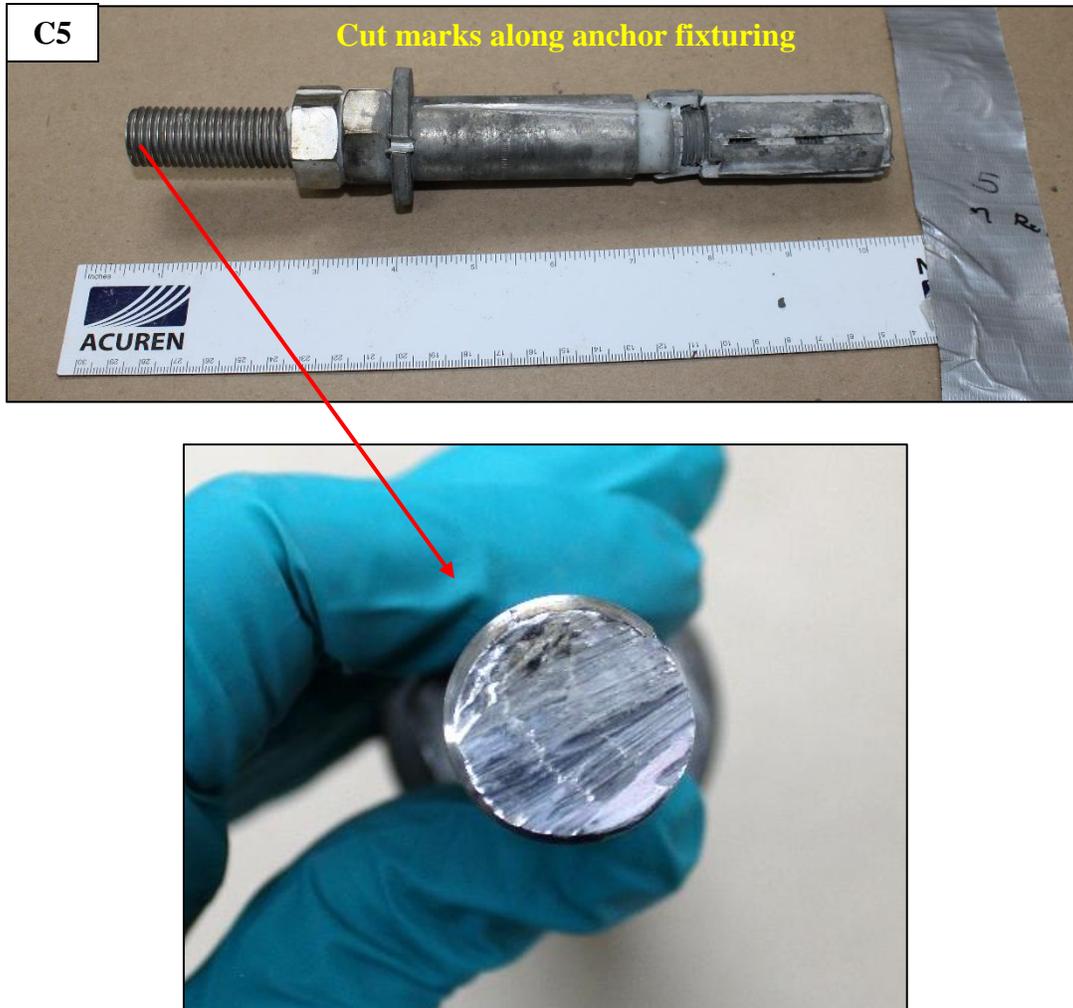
PHOTOS OF BOLT C5 AND THE CUT MARKS AND HEAT TINTING OBSERVED ON ONE END. NO FRACTURE SURFACE WAS VISIBLE.
